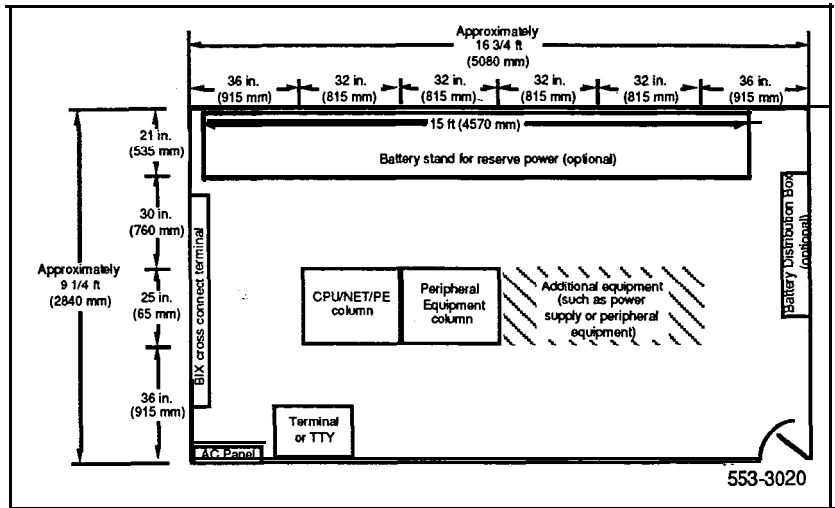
, 6, and 7 show some sample equipment room floor plans. These may vary from your own.
